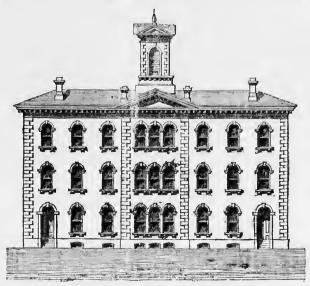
Design No. 47. - Geometrical Elevation of Fig. 157, adapted to Fig. 158.
